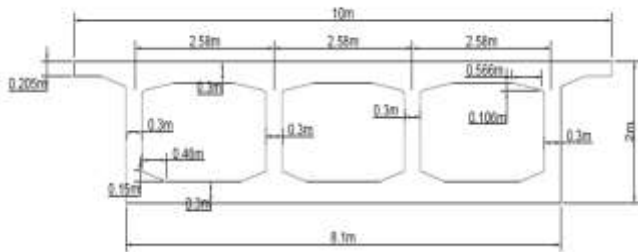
(a) Cross Section of the Vertical Exterior Girder Deck
